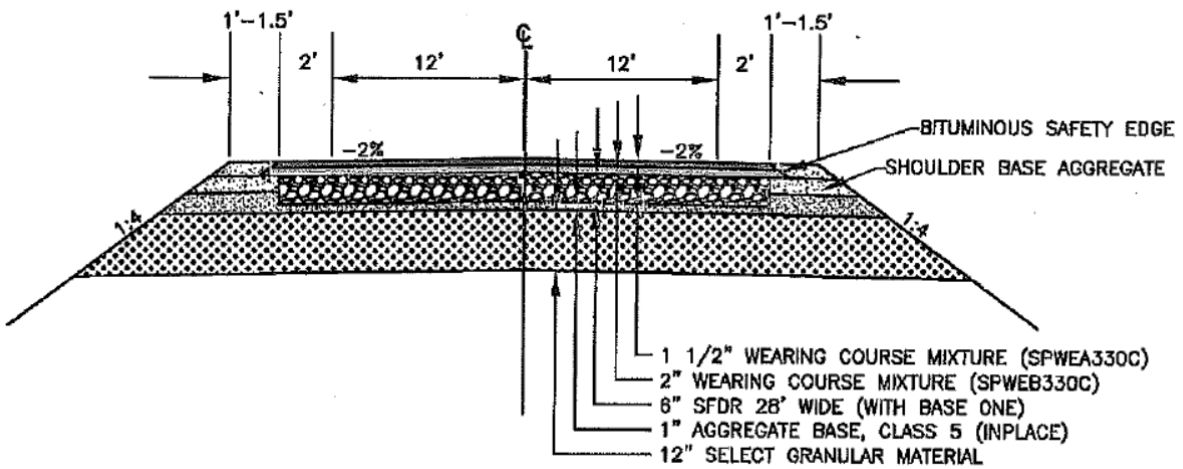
Hubbard CSAH 46 Proposed Typical Section
